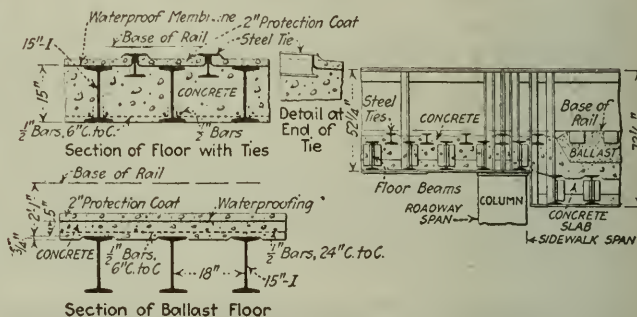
BRIDGE FLOOR HAS STEEL TIES EMBEDDED IN CONCRETE
